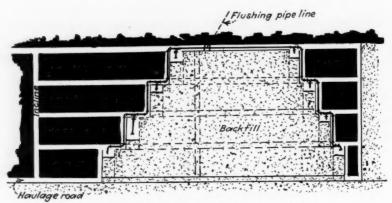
Shortwall Mining With Hydraulic Backfilling
